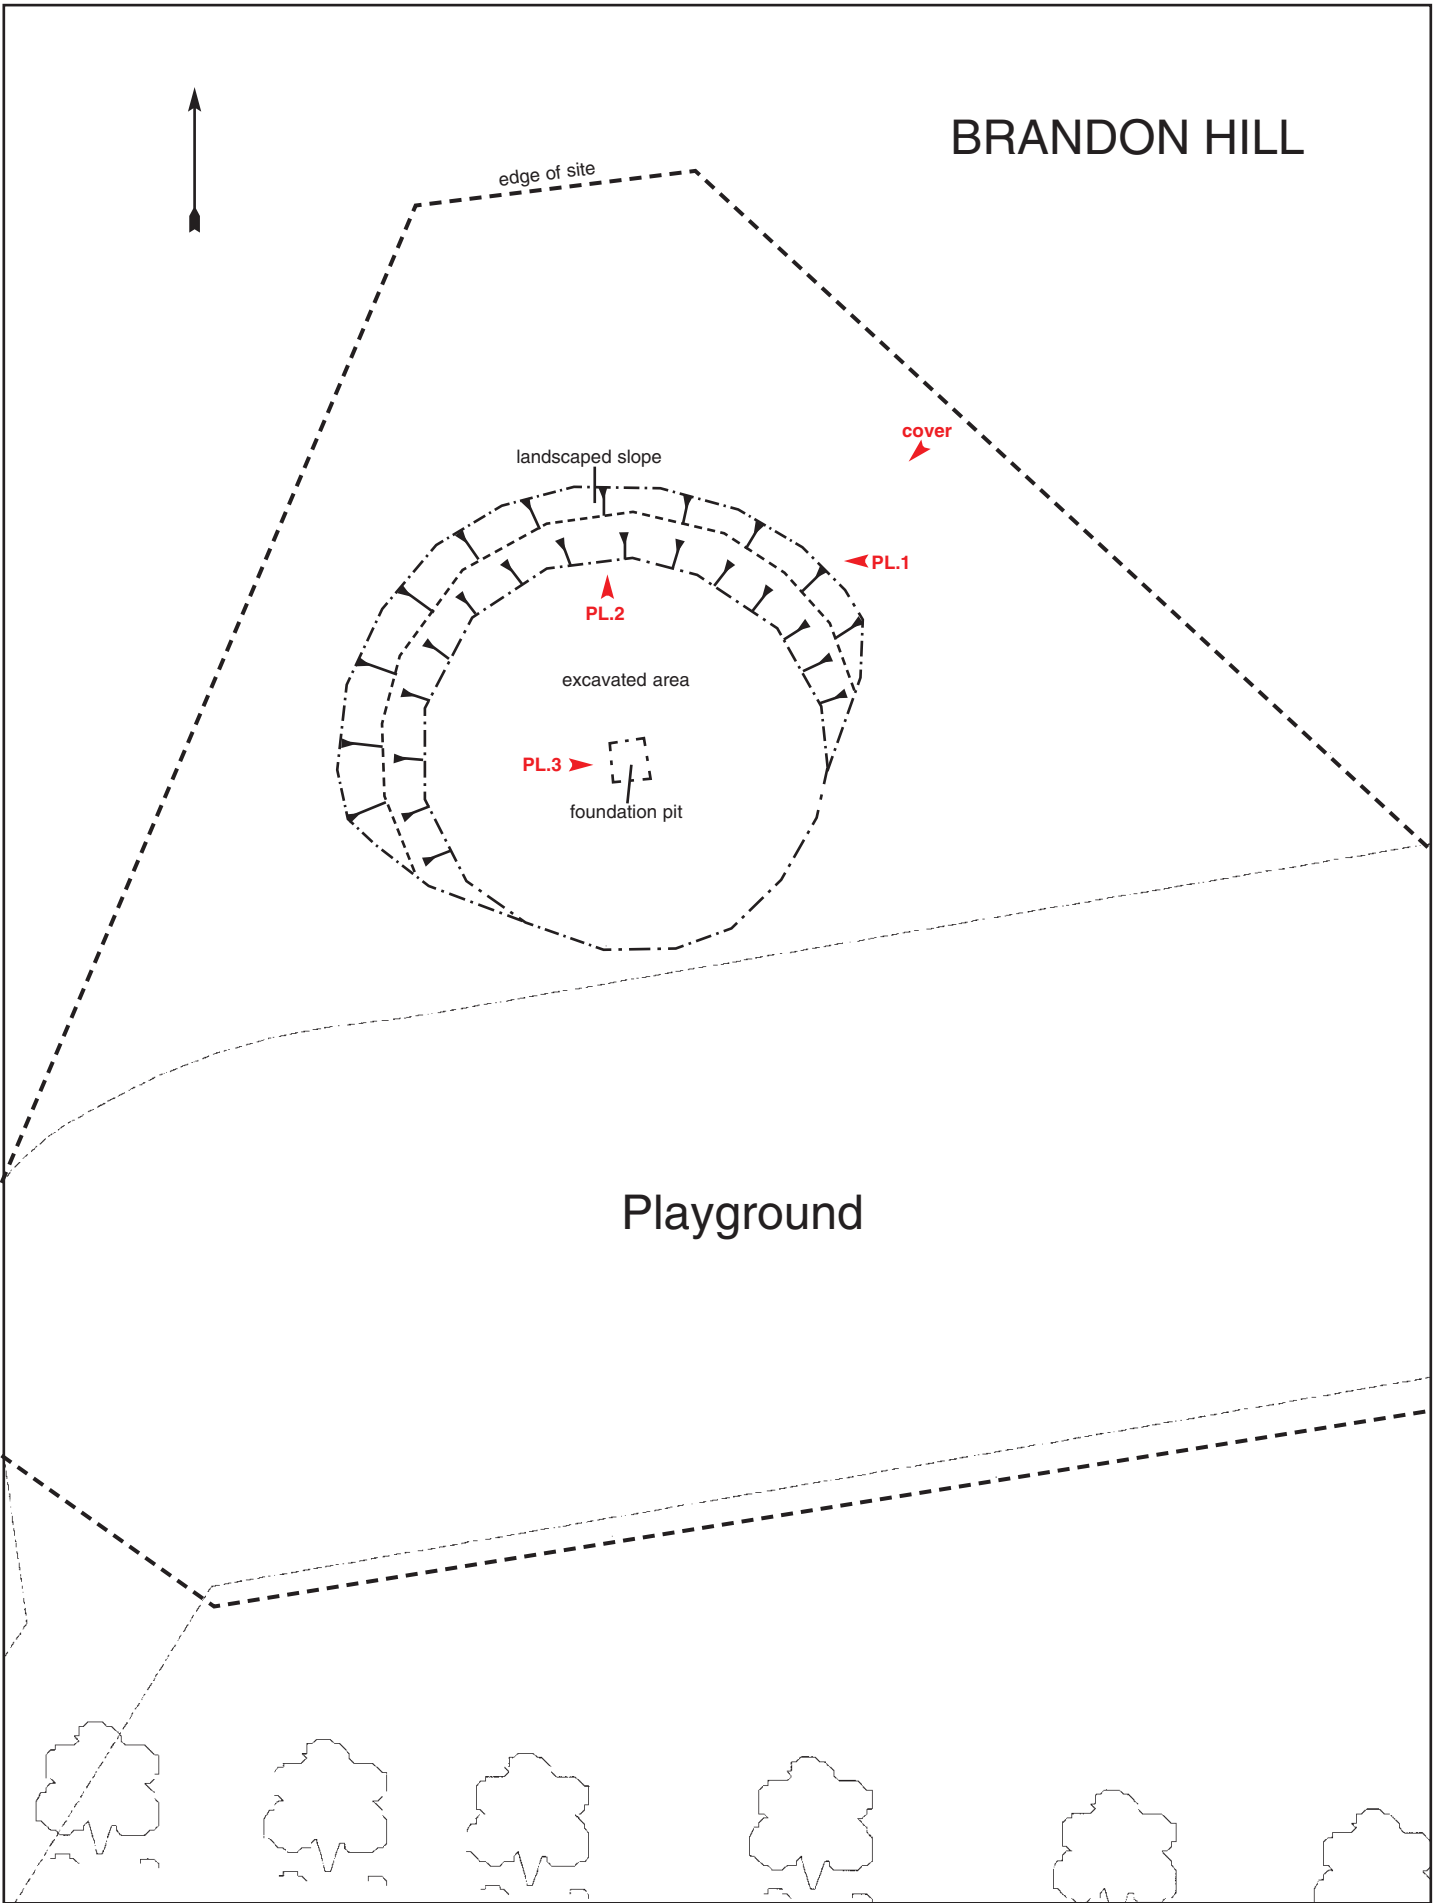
Plan showing study area in detail and plate locations, scale 1:200
